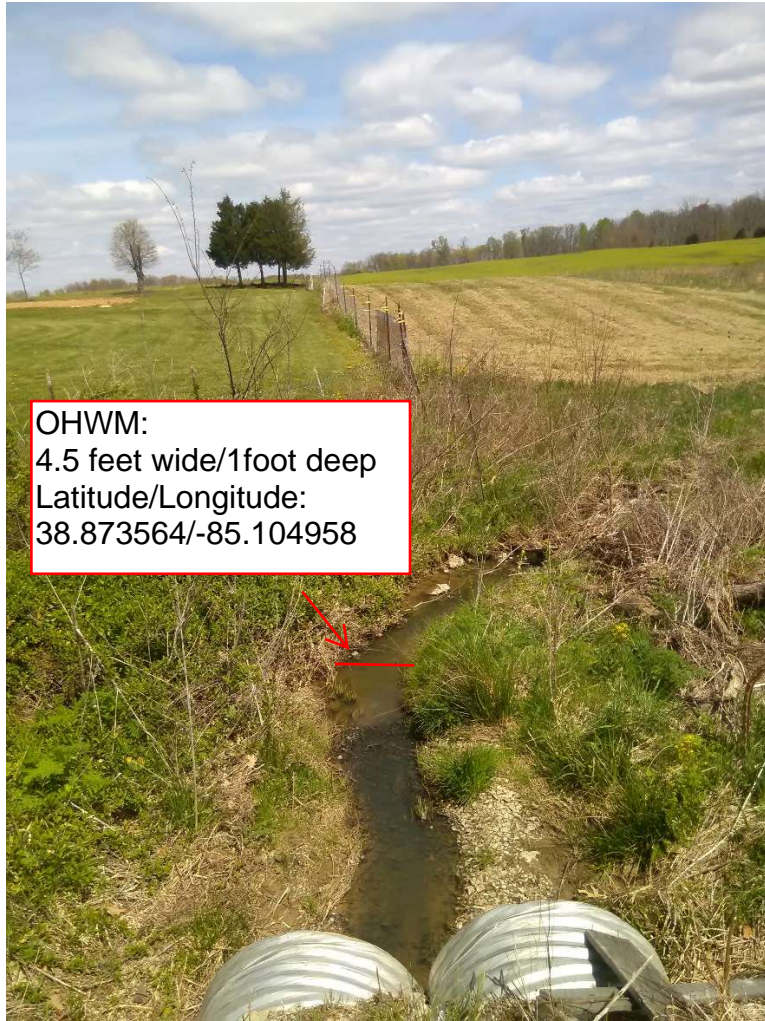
Facing north at UNT 1 to Bear Branch and structure outlet from SR 250. (4.16.21)
